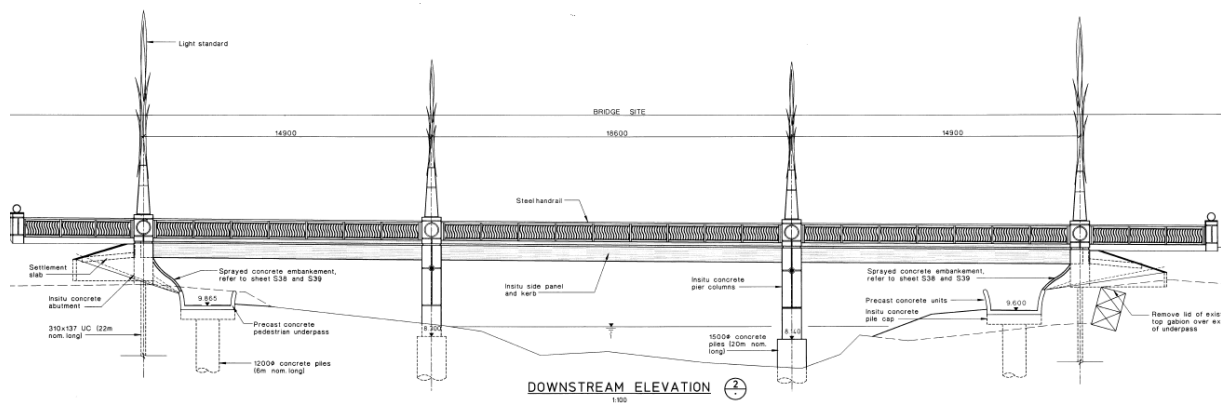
ANZAC Bridge downstream elevation, Christchurch City Council design drawing
